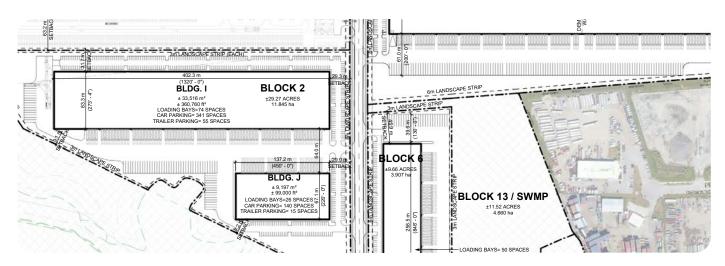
Extract of revised site plan showing loading bays generously setback from the street line. Courtesy of Turner Fleischer Architects Inc.
